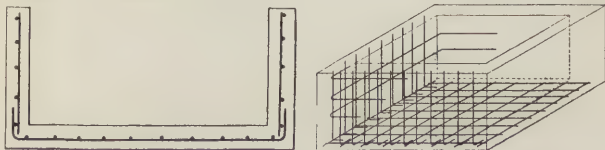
Details of Reinforcement, Showing Bends and Turnups in Corners.
